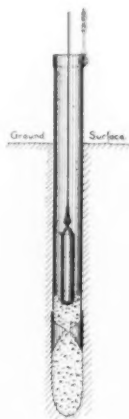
Steel shell partially withdrawn and the concrete being rammed.
